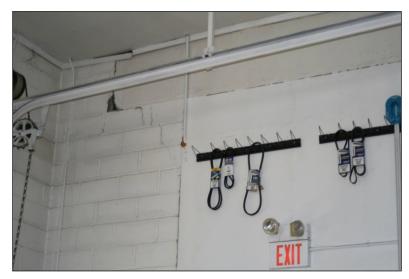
Cracking in the inside corner of a Nevada Department of Transportation garage.
